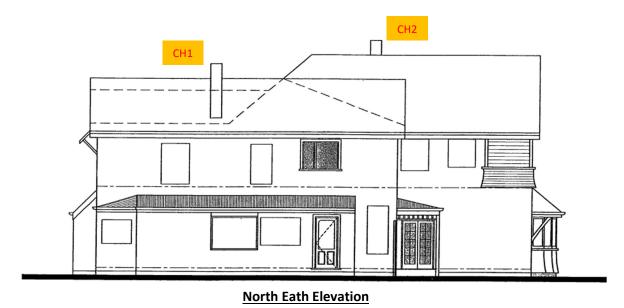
North east elevation of the property located at 38 Normandale Road, Minoh House, Lower Hutt, showing the chimneys marked CH1 and CH2.
